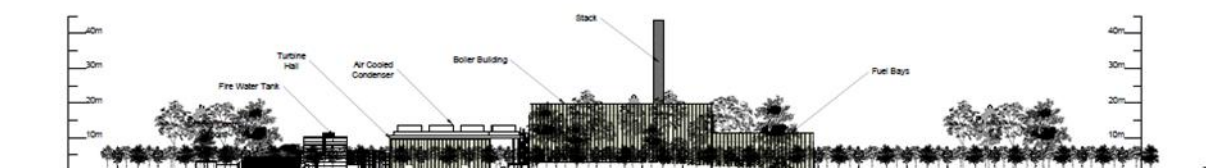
extract from drawing no. D6628-MP-0004 Rev A5 'Site Elevation Drawings' (view from the northeast)
